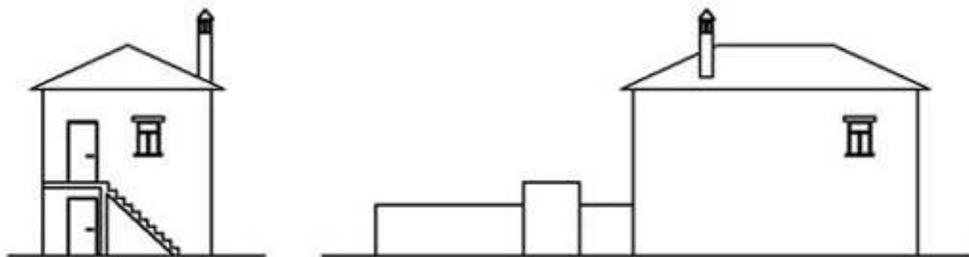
House type 3: Front side elevation (left) and right side elevation (right) (Drawings by author)
